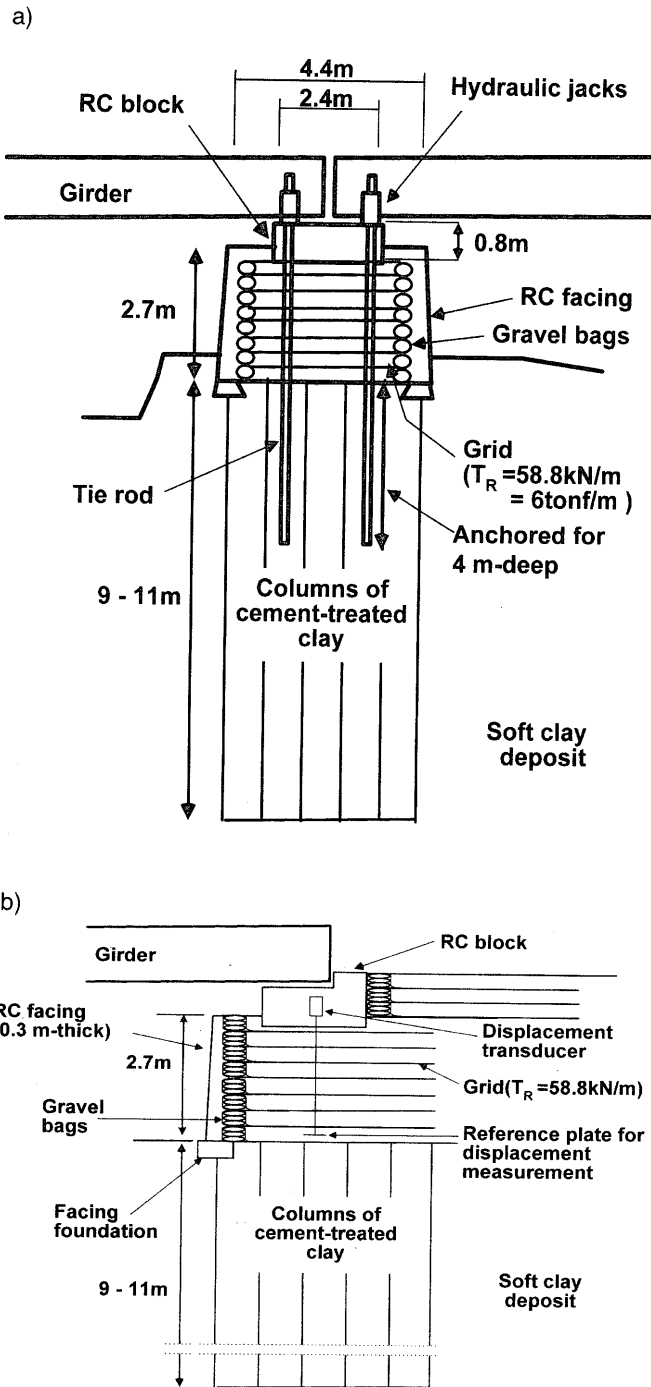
a) PLPS reinforced soil pier and b) reinforced soil retaining wall abutment
